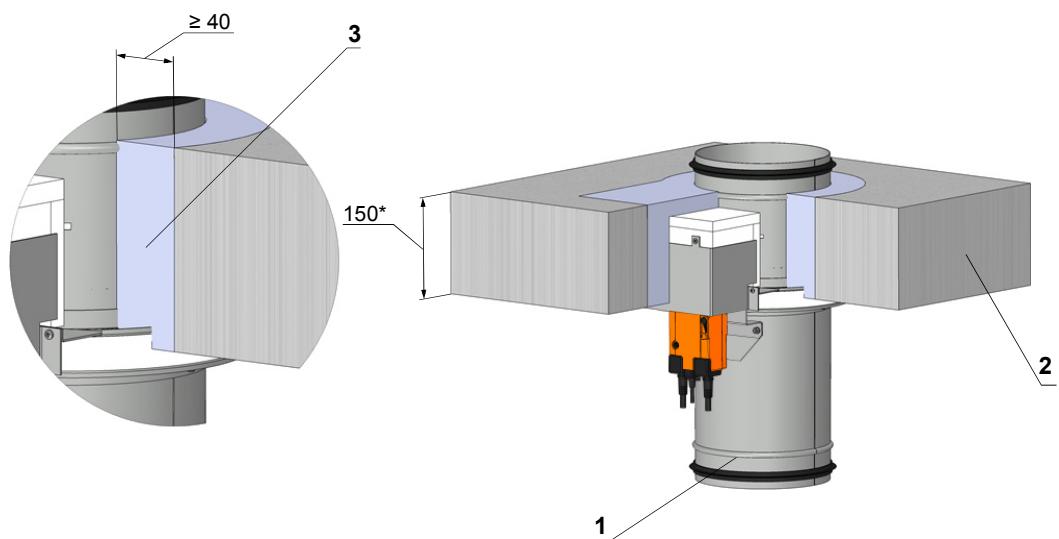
Solid wall construction - stuffing box and fire protection mastic
